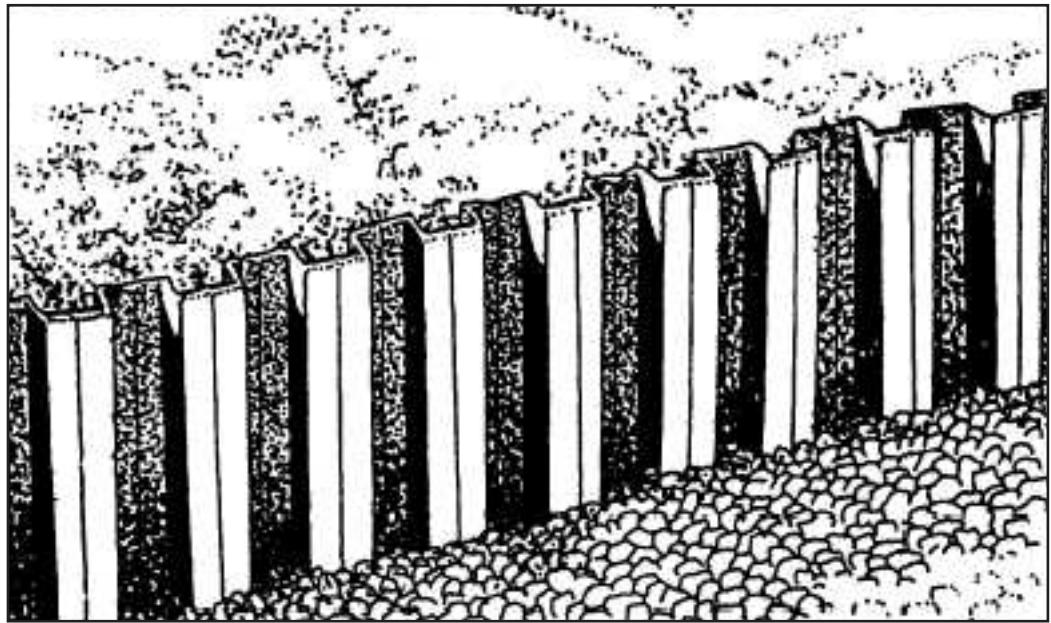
Elevation drawing of steel sheet pile bulkhead (from http://www.tpub.com/content/engineering/14071/css/14071_22.htm).
